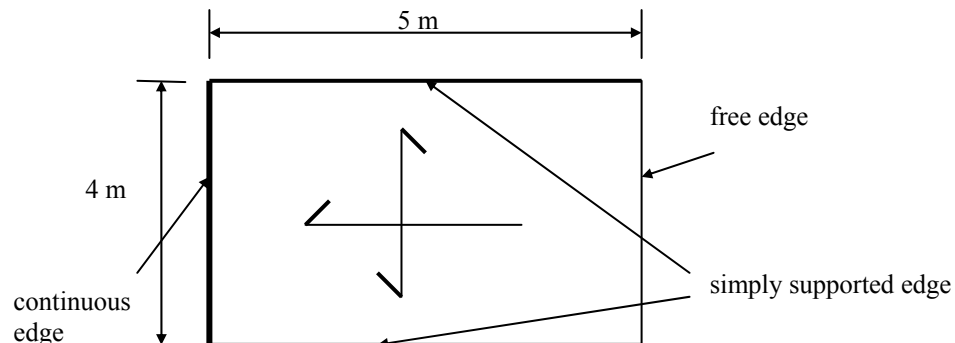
Plan of 3-sides supported slab for Worked Example 4.3
